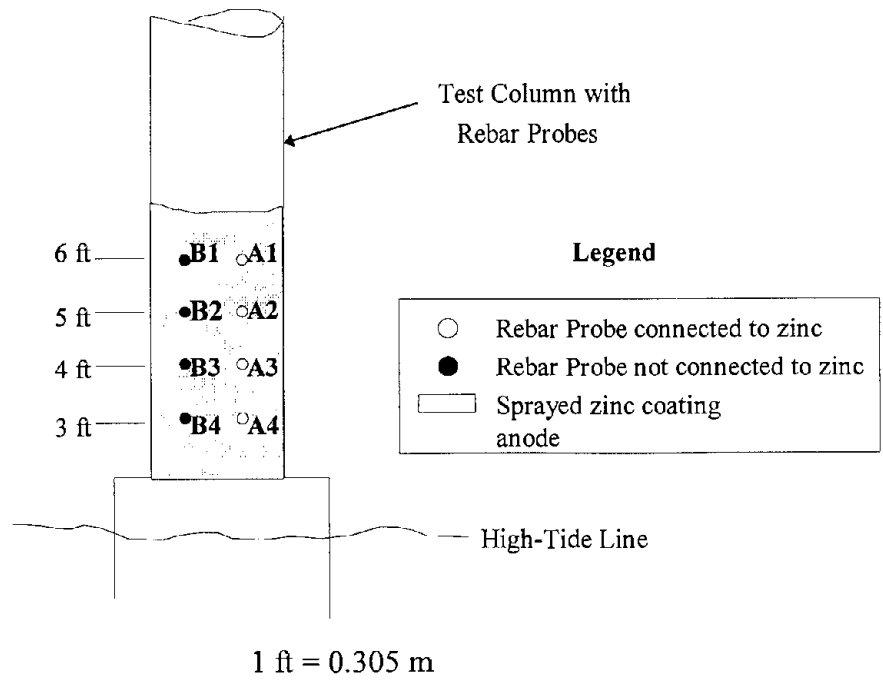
Schematic of rebar probes on Niles Channel Bridge.
